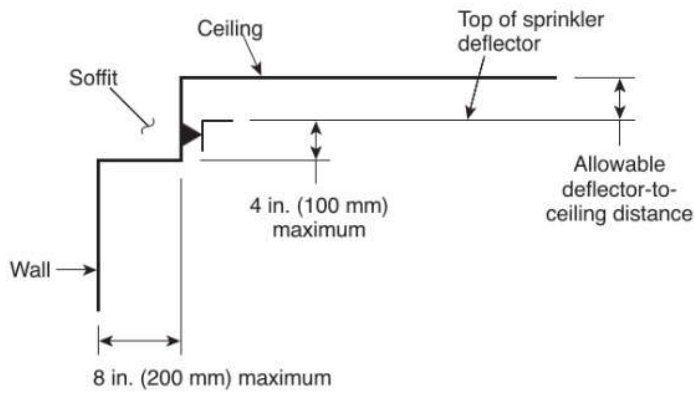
Location Sidewalls with Respect to Soffits — Sidewall in Soffit.
